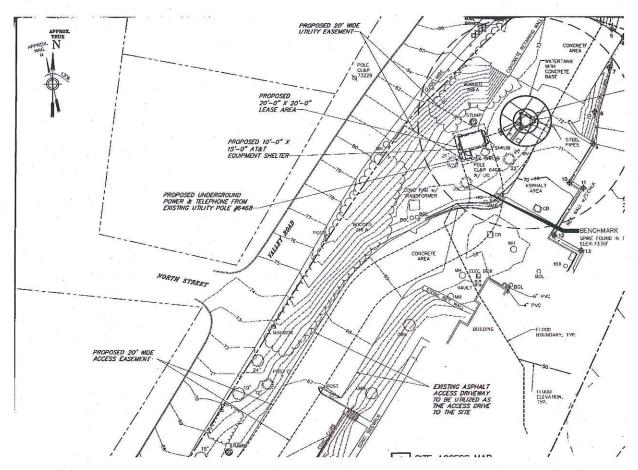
Site plan for the proposed facility. (AT&T 1, Tab B)
